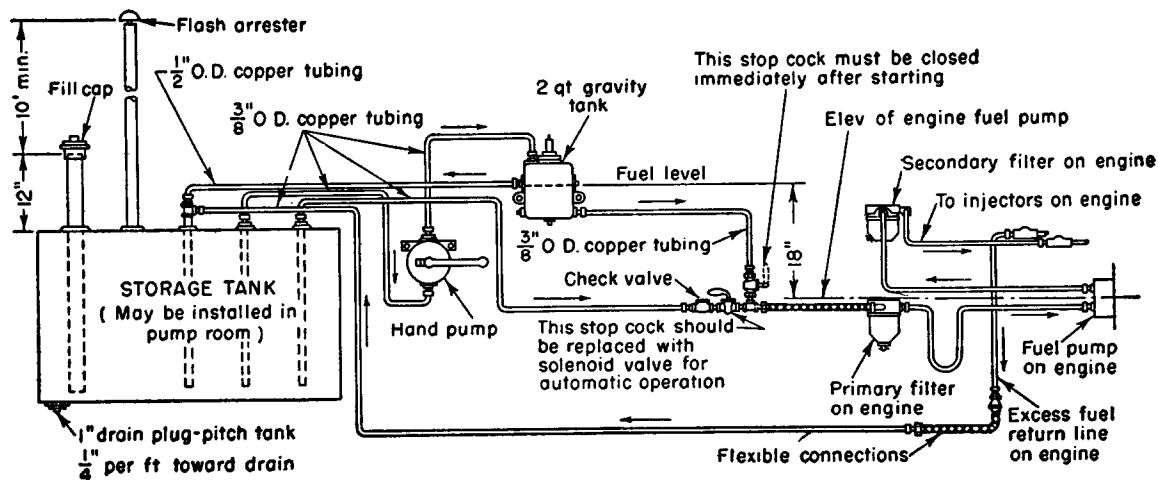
Fuel System for Diesel Engine Driving Fire Pump.
